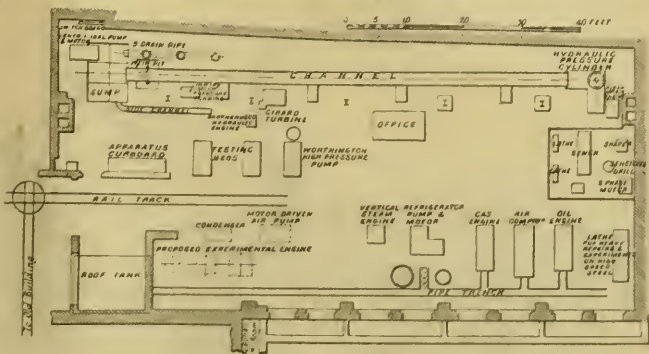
Plan of the Engineering Laboratory [the City and Guilds Technical College, Finsbury.]
